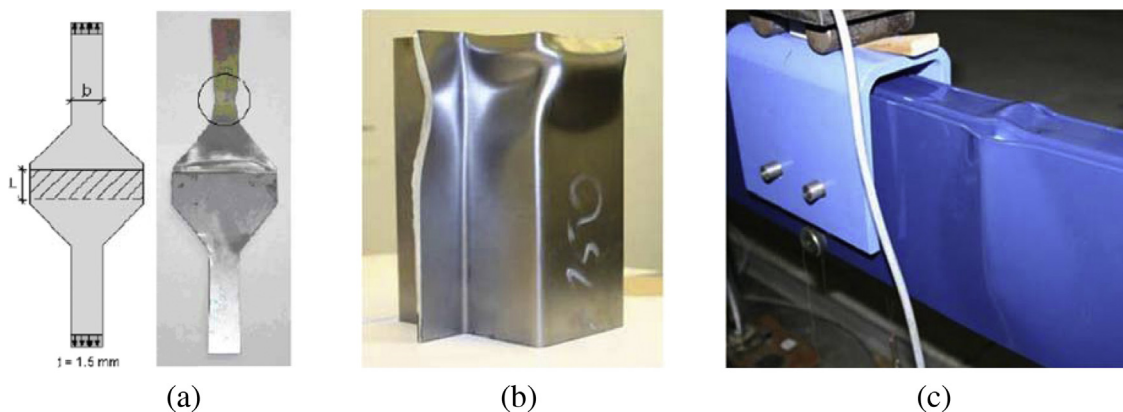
(a) Yielding of the adherend in a steel bonded joint under tension. (b) Local buckling in a bonded lightweight steel column under compression. (c) Local buckling in RP 1806-beam strengthened by bonding an internal steel plate (bending test).
